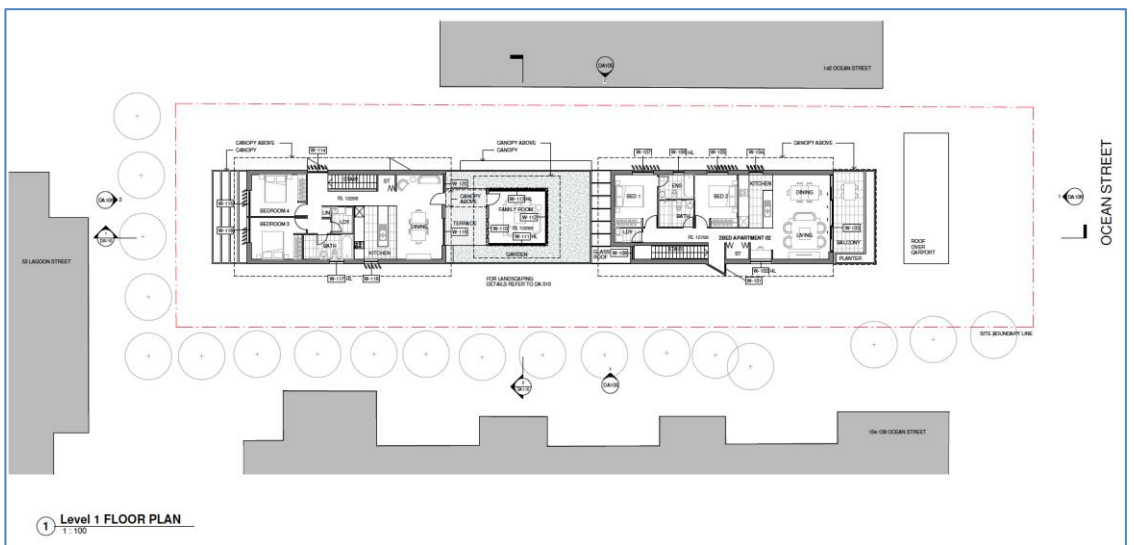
Proposed Site Layout Plan (extract from DA009)
